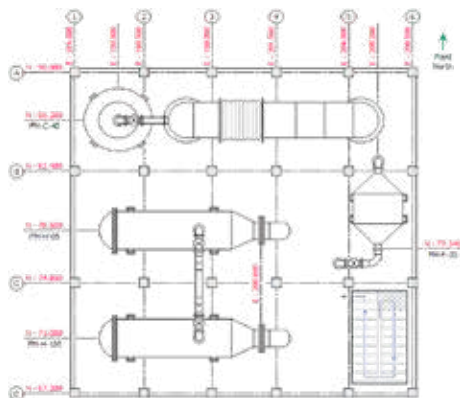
Top view 4th floor detailed plot plan at EL.129200
